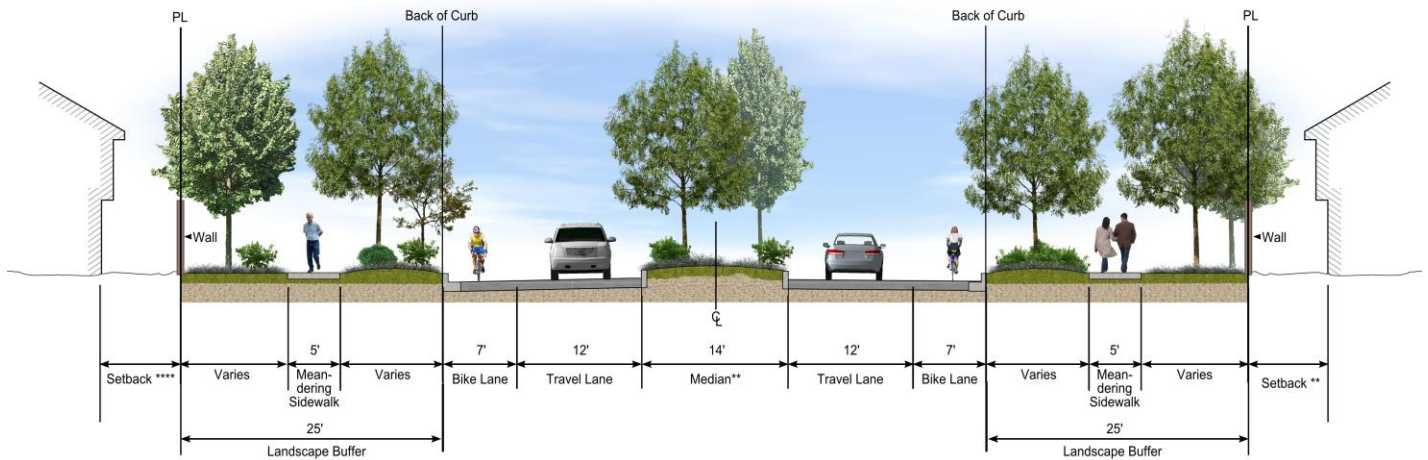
David Allen Parkway Conceptual Detail
